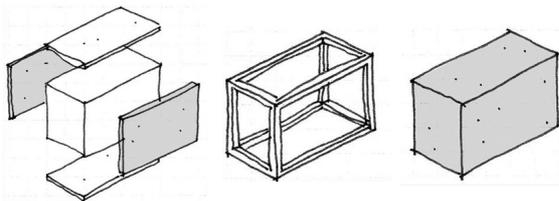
Wall Panels, Structural Frame and Cellular Module Building Systems
